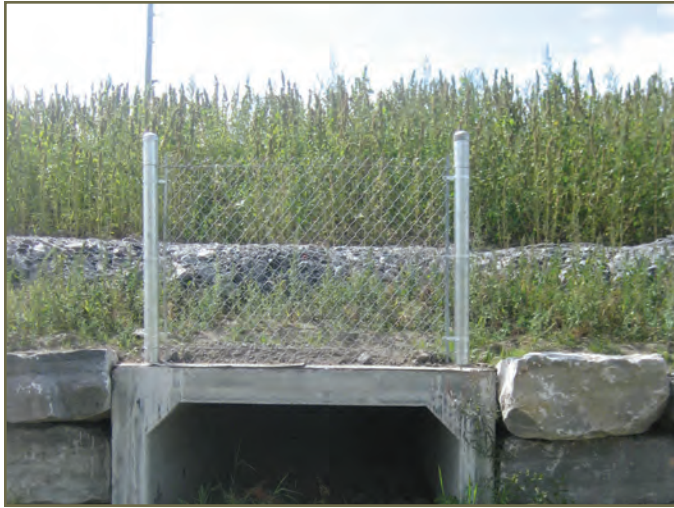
Fencing above tunnel, Terry Fox Drive extension © K. Gunson
